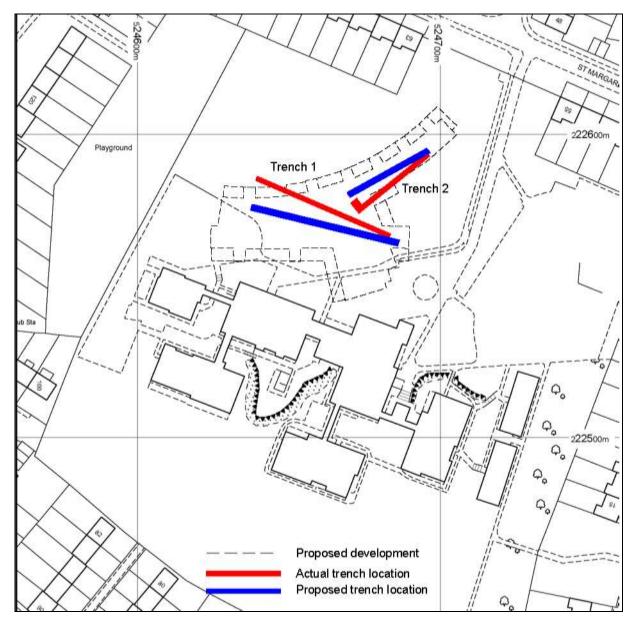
Site plan, showing proposed and actual trench locations (scale 1:1250)
